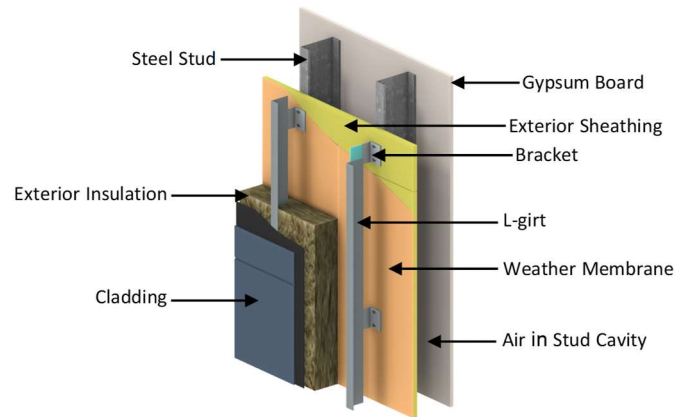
Exterior insulated steel-framed composite wall assembly. [137]
